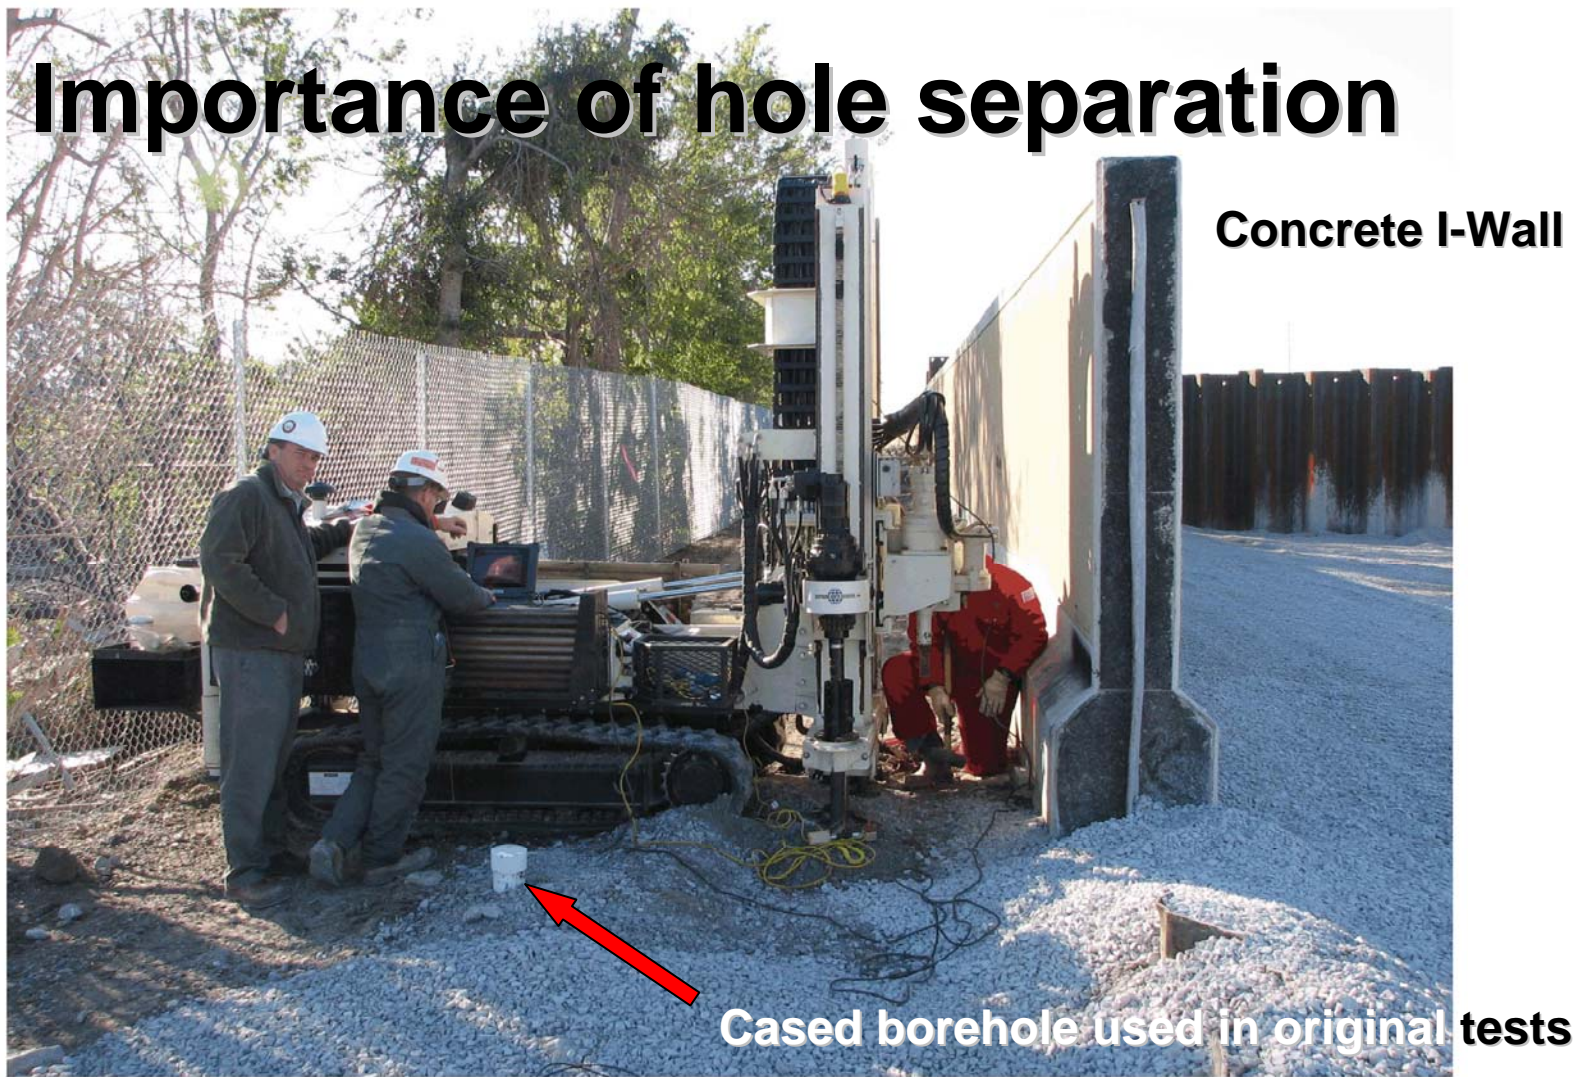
Geoprobe Rig for PS/SCPT testing at South End of Breach of 17<sup>th</sup> Street Levee at Station 17+78 where sheet piles were exposed by USACE PS Cased Borehole (white PVC cap visible)
